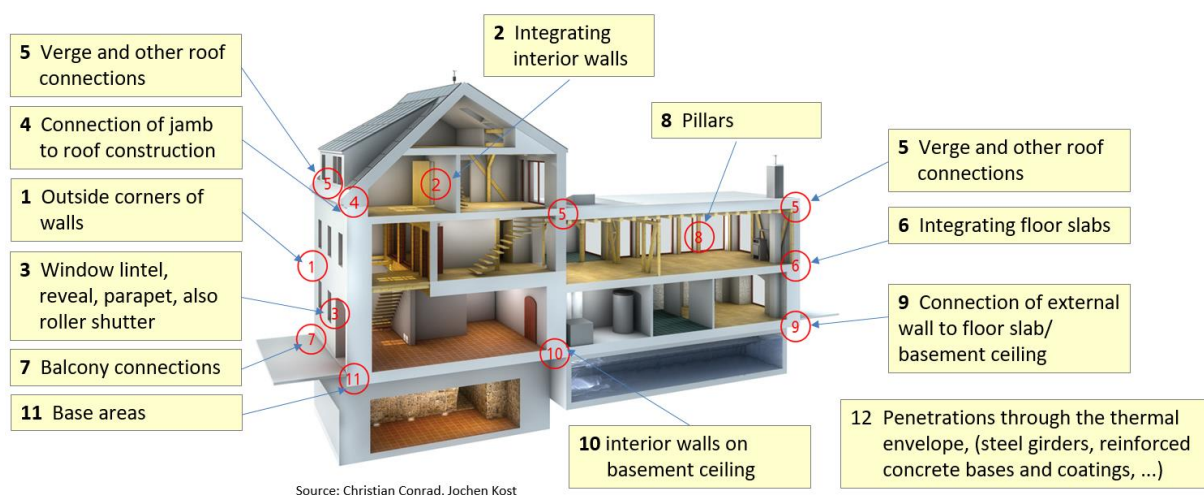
Illustration of common critical connection details in buildings with internal insulation.
